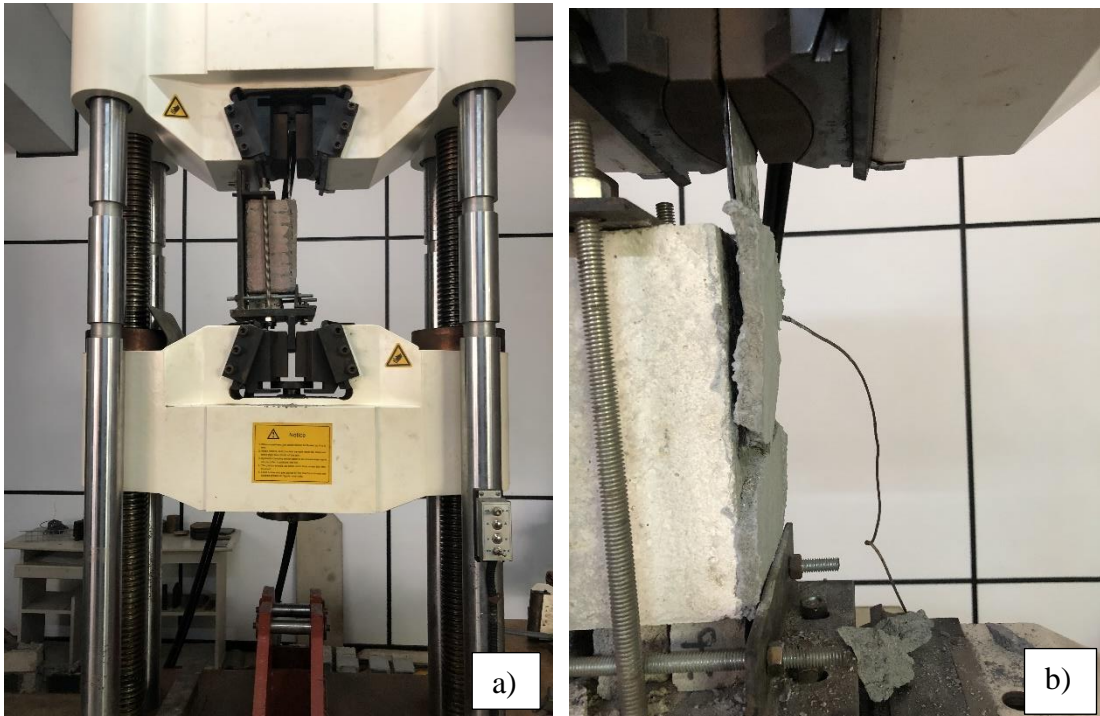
a) Universal testing machine (UTM) b) Pullout failure
